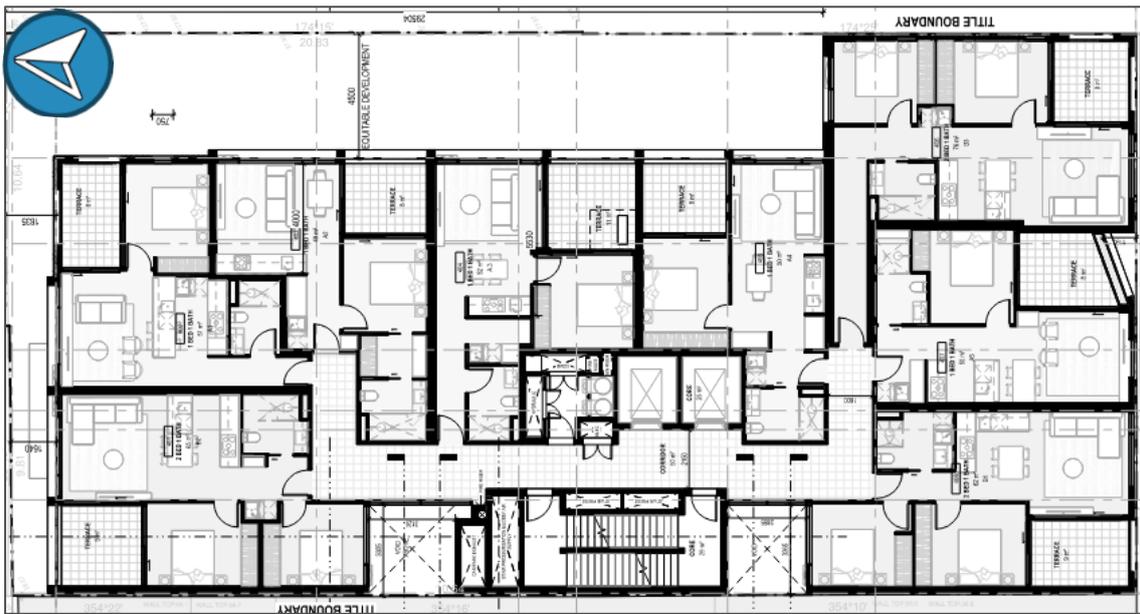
Proposed Level 03-12 Plan (Image Source: Cera Stribley)
